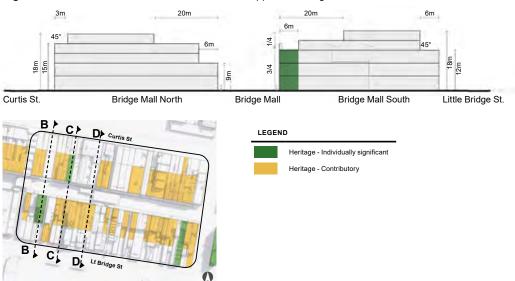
Built form test of street wall, setback and upper level heights- Section B
